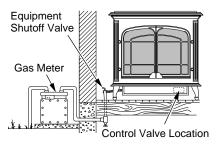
Checking Gas Joints (Oxford™ Stove Model Shown)
